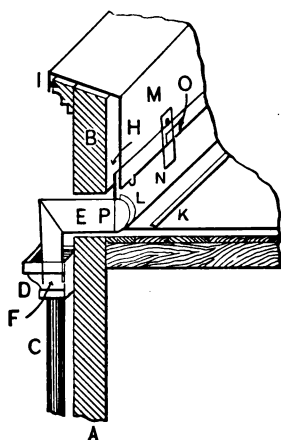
Flashing Around a Tube and Over a Parapet Wall.
